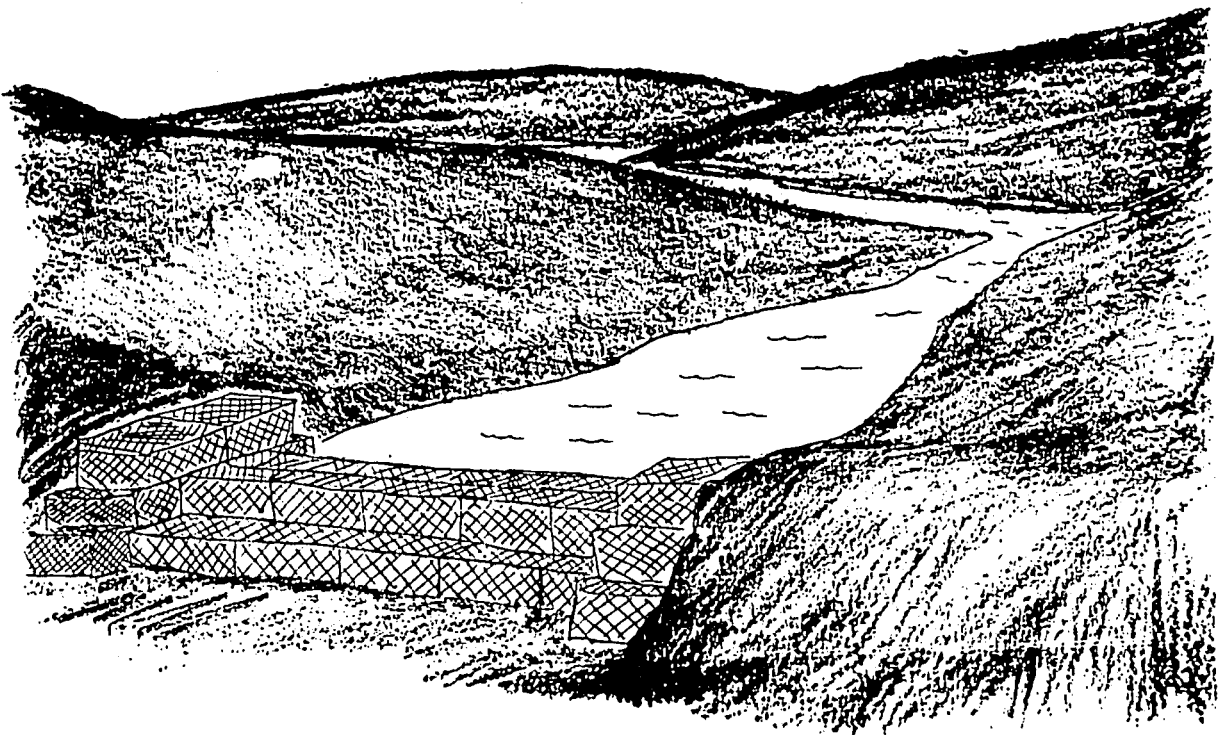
Gabions are filled with rock and placed across small valleys to act as a barrage to retard runoff. Runoff water collected behind the barrage seeps into the ground. Resulting high soil moisture allows farmers to plant crops behind the barrage after rainy season.
